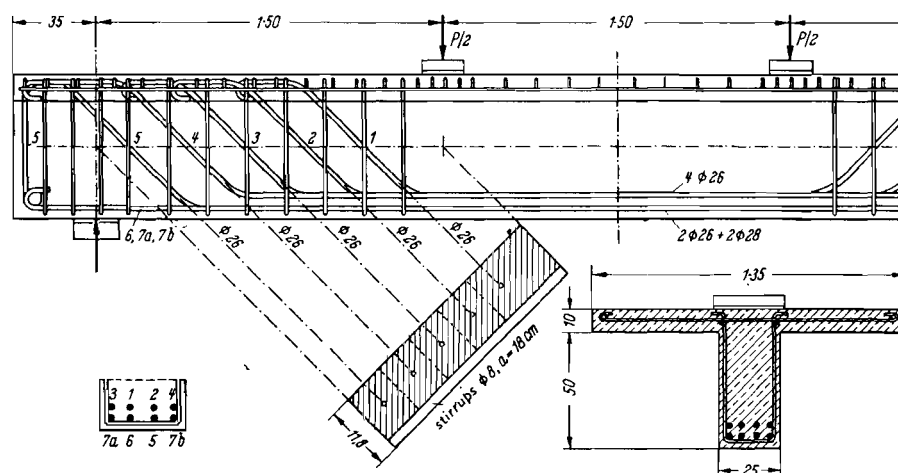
Test beam 1124 of the supplementary tests for Communication No. 48 of the German Committee on Reinforced Concrete (full safeguard against shear failure).
